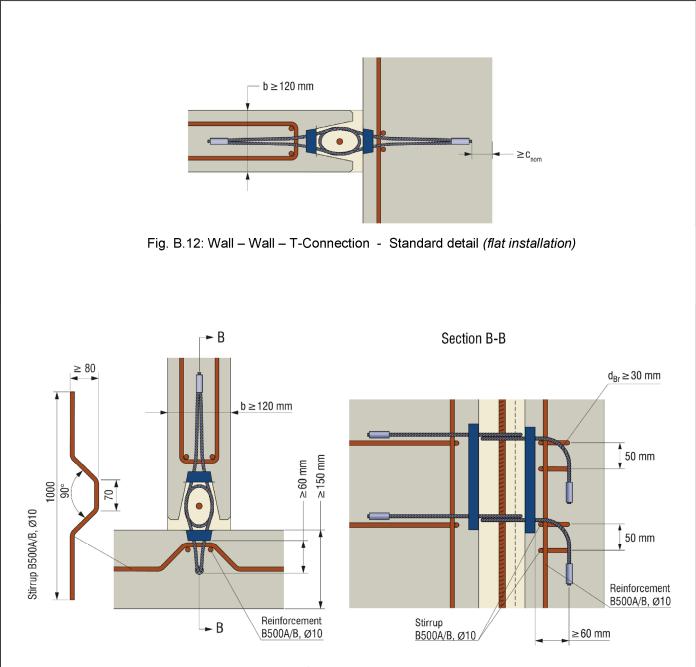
Wall – Wall – T-Connection - Detail with bended wire loops
